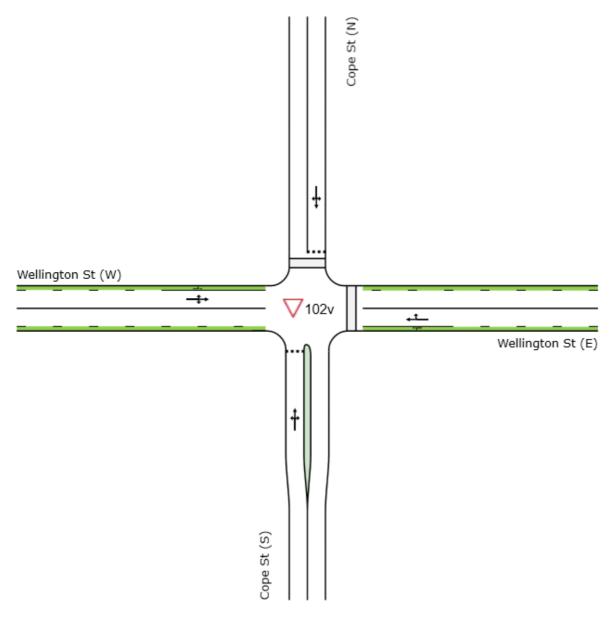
Cope Street and Wellington Street Intersection Upgrade
